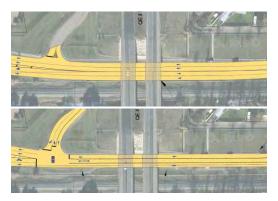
Black Gold Drive Interim Stage Alternatives (Top, 4-lane cross-section; Bottom, 3-lane cross-section with reversible center lane)
